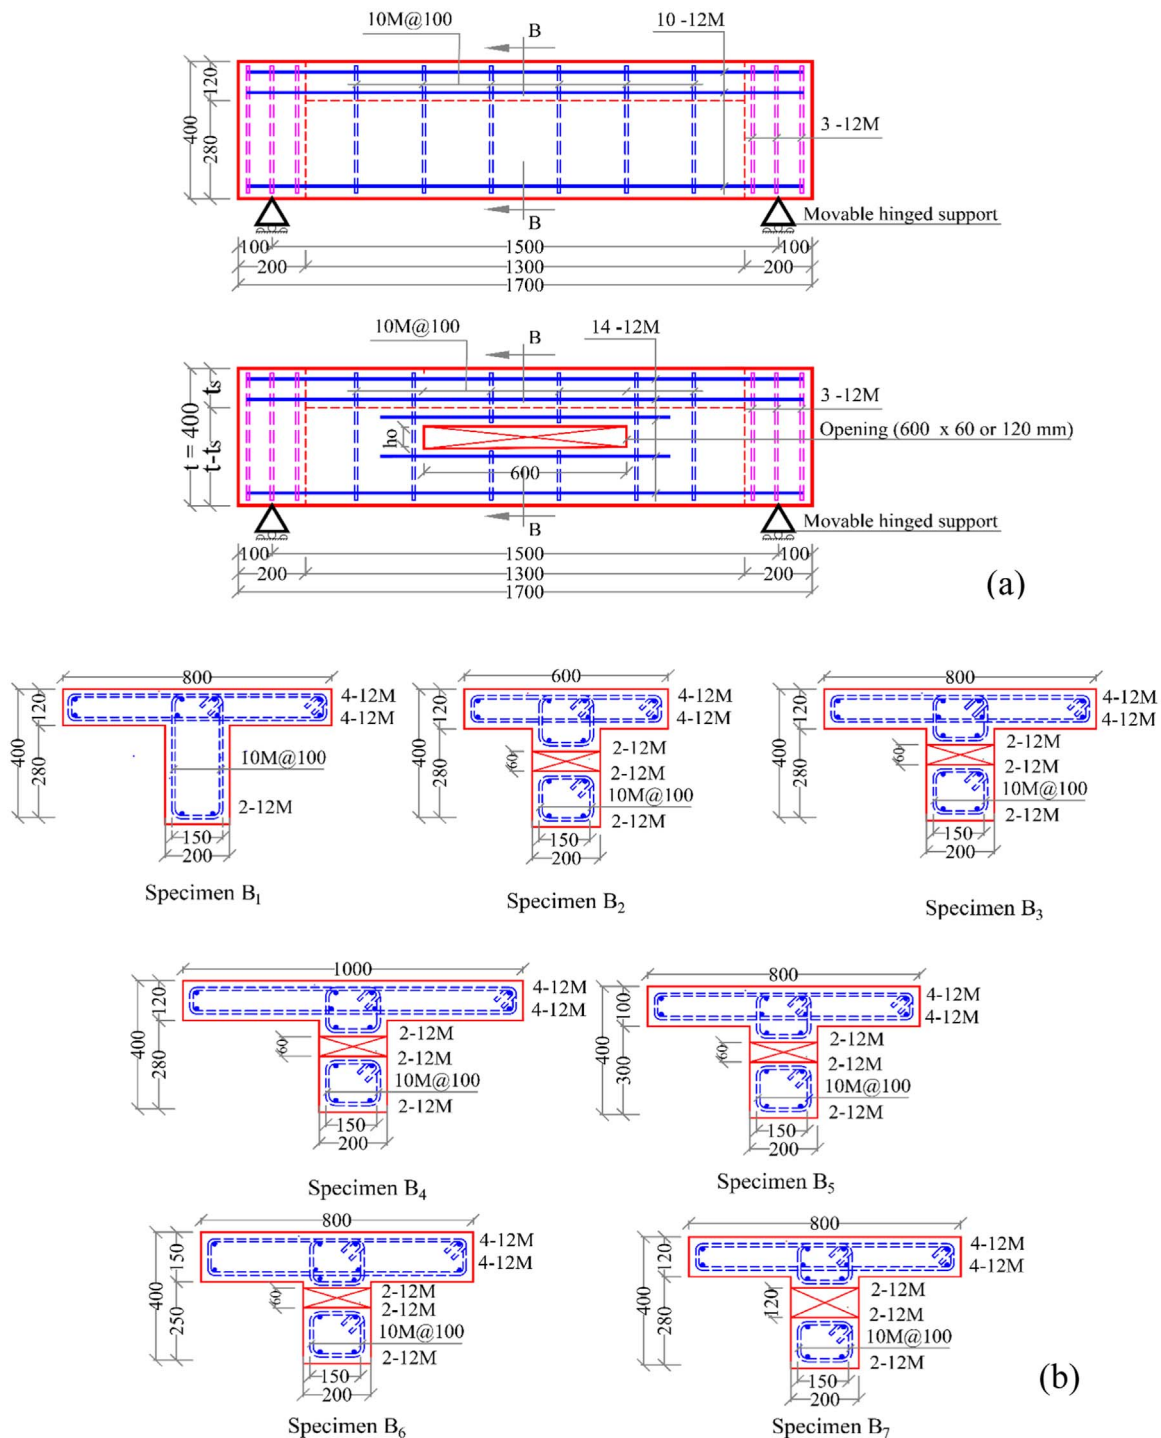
Dimensions and details for all tested specimens (a) Typical elevations for control specimen and specimens with openings (b) Cross sections for all tested specimens.
